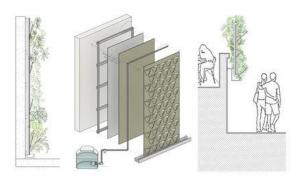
Example planting facade. Source: Muro Verde / Jardin Vertical [from authors private archive]
